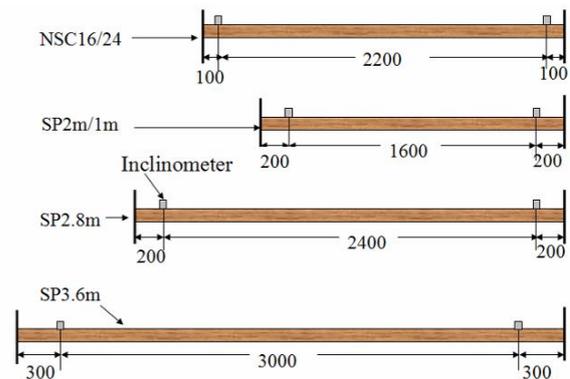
Shear strength test arrangements for SP and NS joists (lengths in mm)
